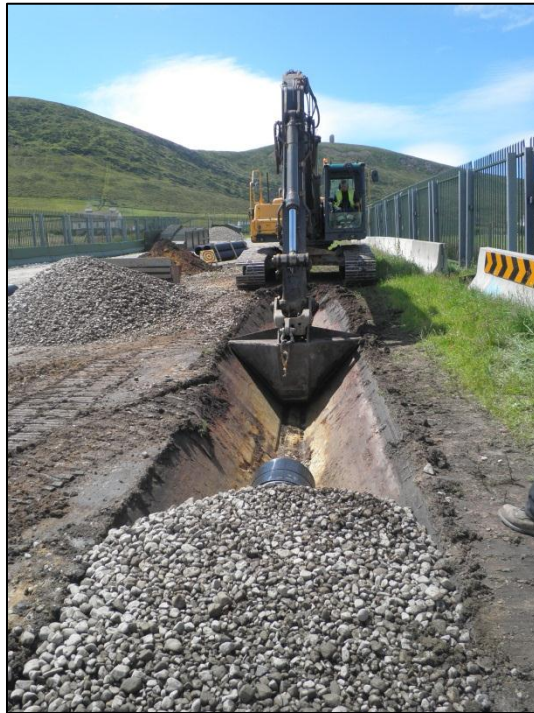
Glengad: Excavation of v-ditch along site access road, facing south.
